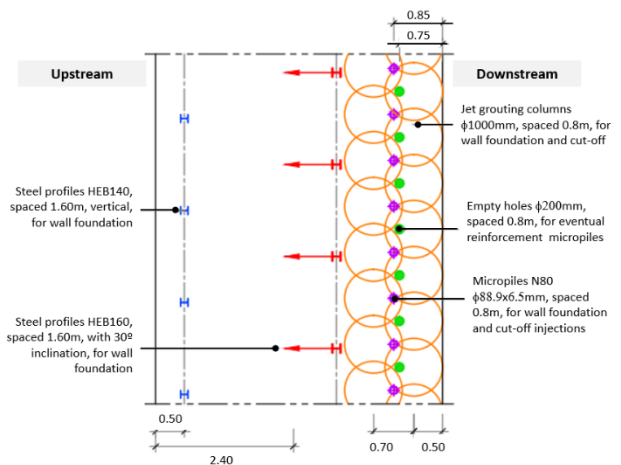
Plan distribution of HEB profiles and cut-off jet grouting and micropiles at the gravity wall foundation.
